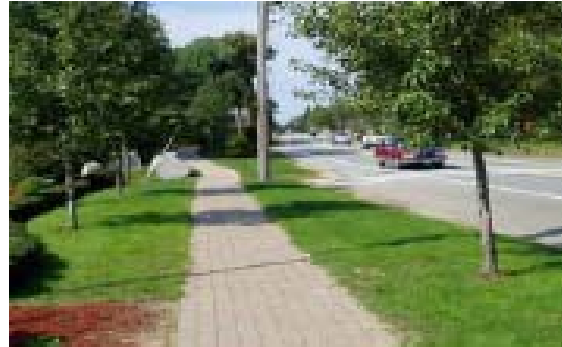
Detached sidewalks in Sanford. Photo credit: Spahr and Dabrowski, LLC.
